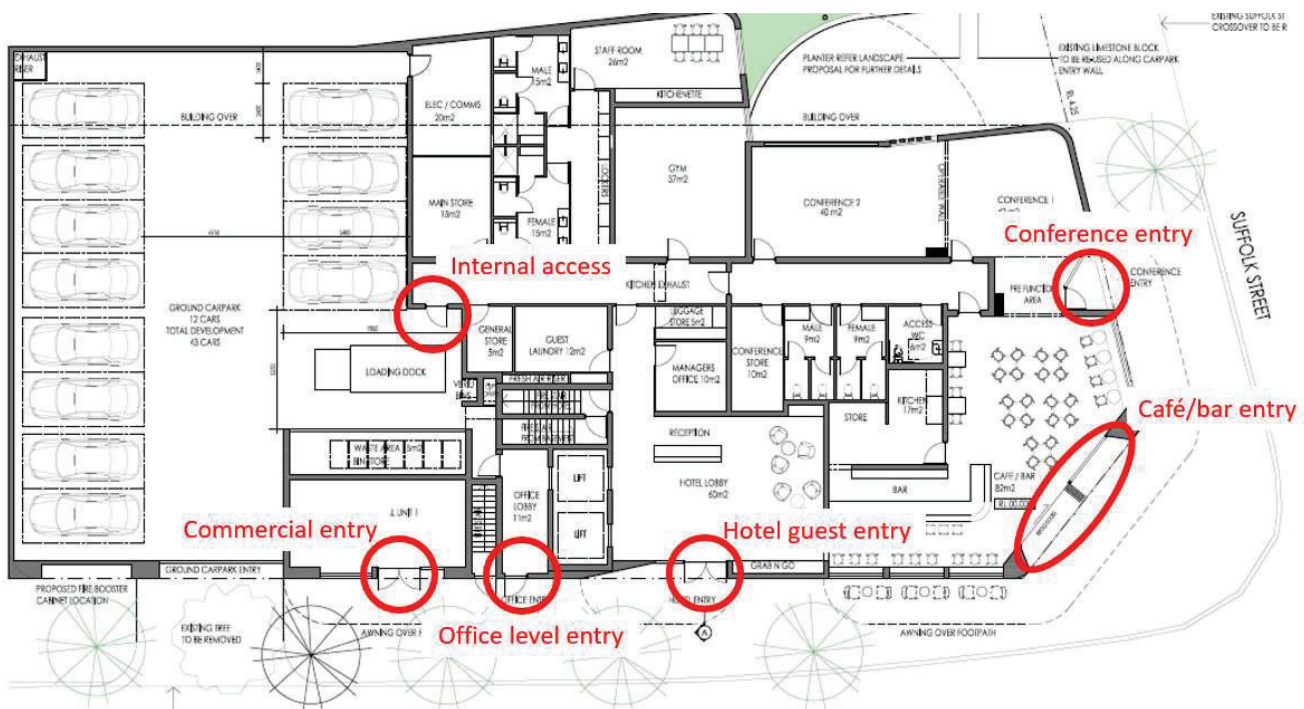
Proposed location of pedestrian access (source: Harris-Jenkins Architects)
